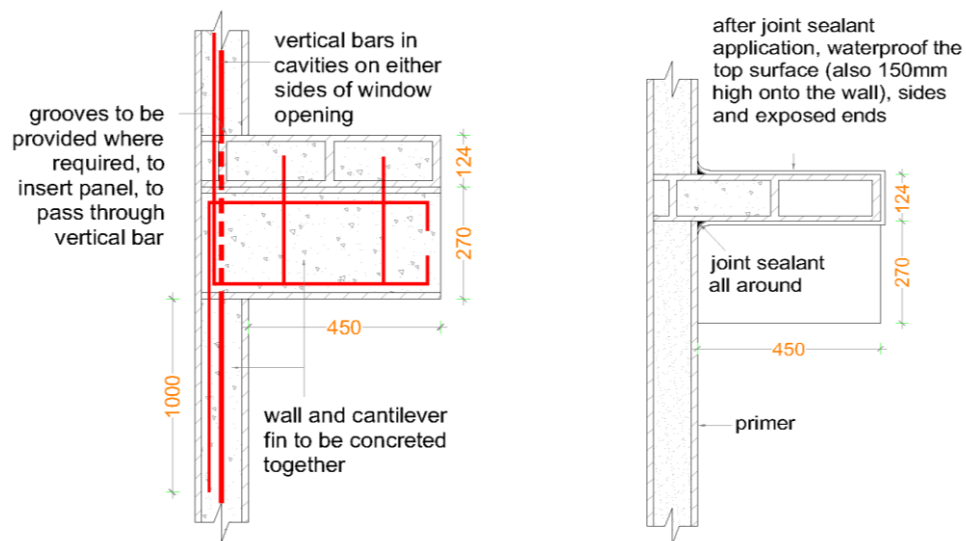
Details of cantilever reinforcement for GFRG fins
